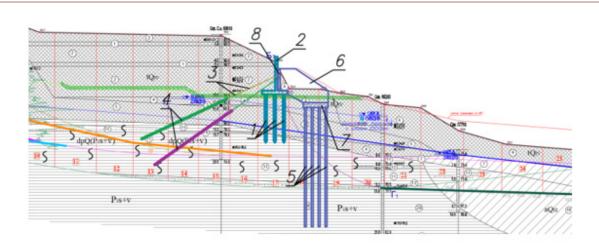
Vertical binding of pile foundations in the engineering and geological section: 1 – pile base of prismatic reinforced concrete piles under the existing; 2 – monolithic reinforced concrete corner rostwerk; 3, 4 – ground anchors ERT (3 – anchor thrust; 4 – anchor root); 5 – drill-injection piles of ERT reinforcement of the base; 6 – monolithic reinforced concrete buttresses; 7 – monolithic reinforced concrete rostwerk; 8 – wall-mounted linear drainage.
